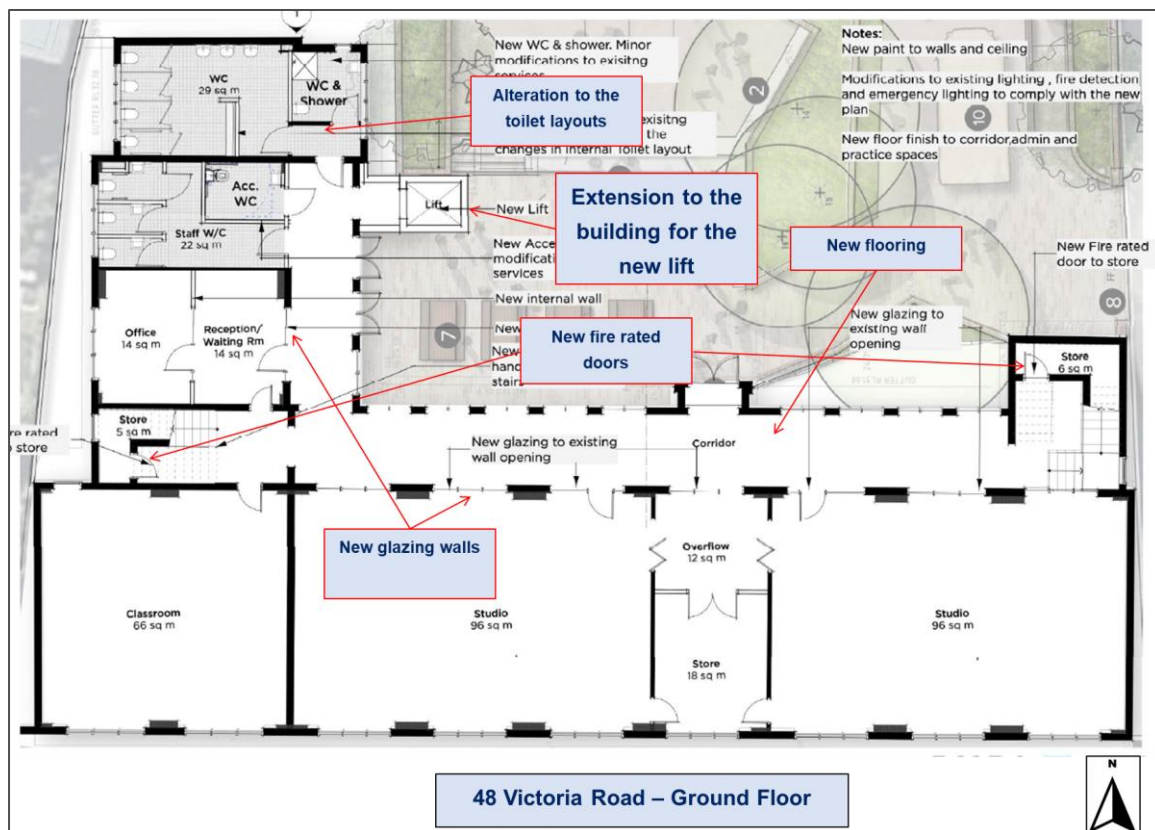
| Proposed alterations (ground floor) - Victoria Road site (Source: Applicant's RtS 2022)
